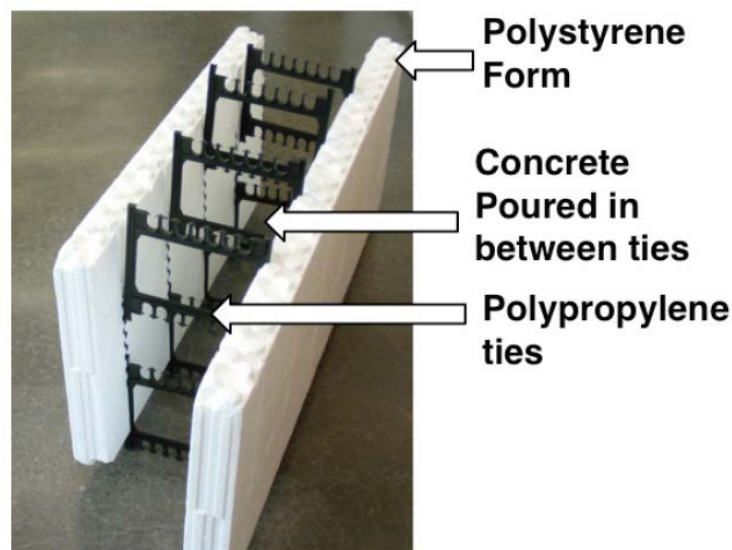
Insulated concrete form, as one section, without poured concrete. [53]
